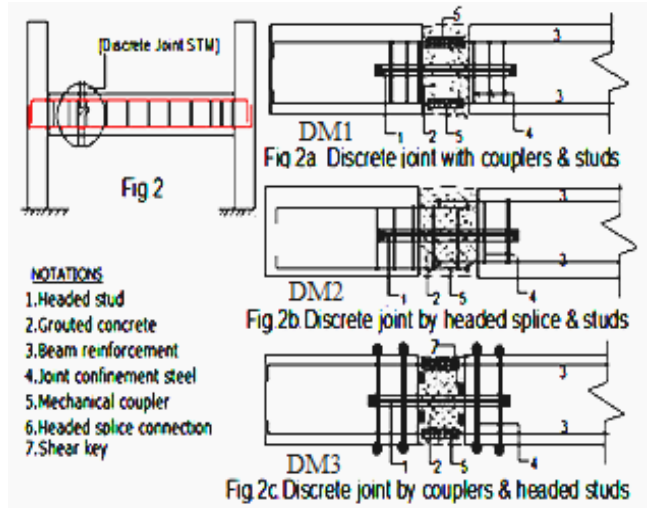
DISCRETE BEAM COLUMN JOINTS BY HEADED ANCHORS/COUPLERS
